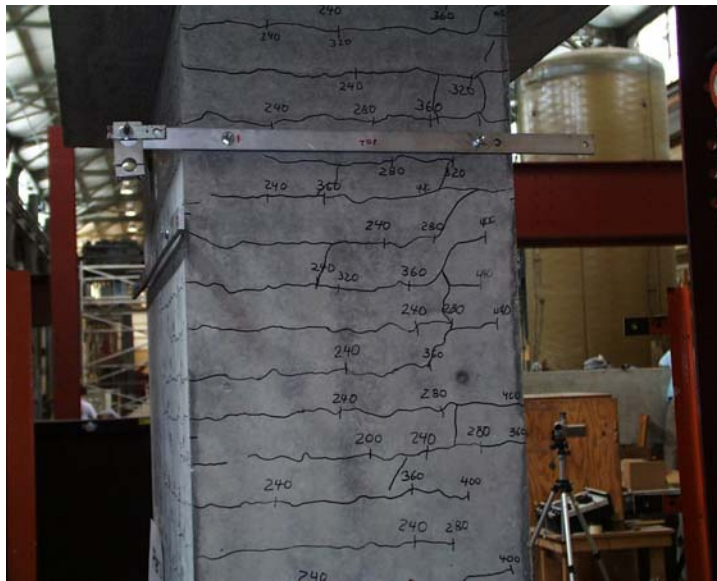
Specimen P14: Photo of South Wall at End of Test
